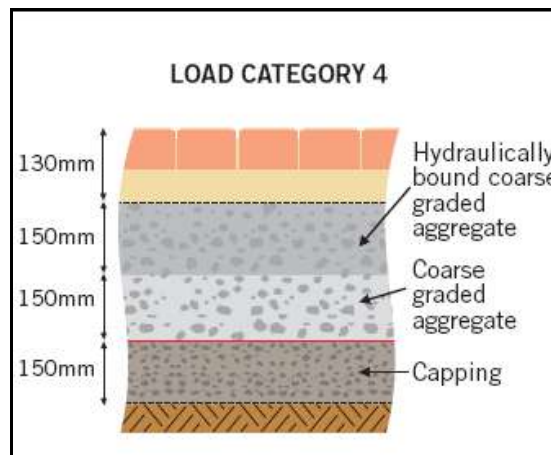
Section through a permeable surface for expected load category (Source: *Interpave Permeable pavements – guide to the design construction and maintenance of concrete block permeable pavements* dated 2010)
